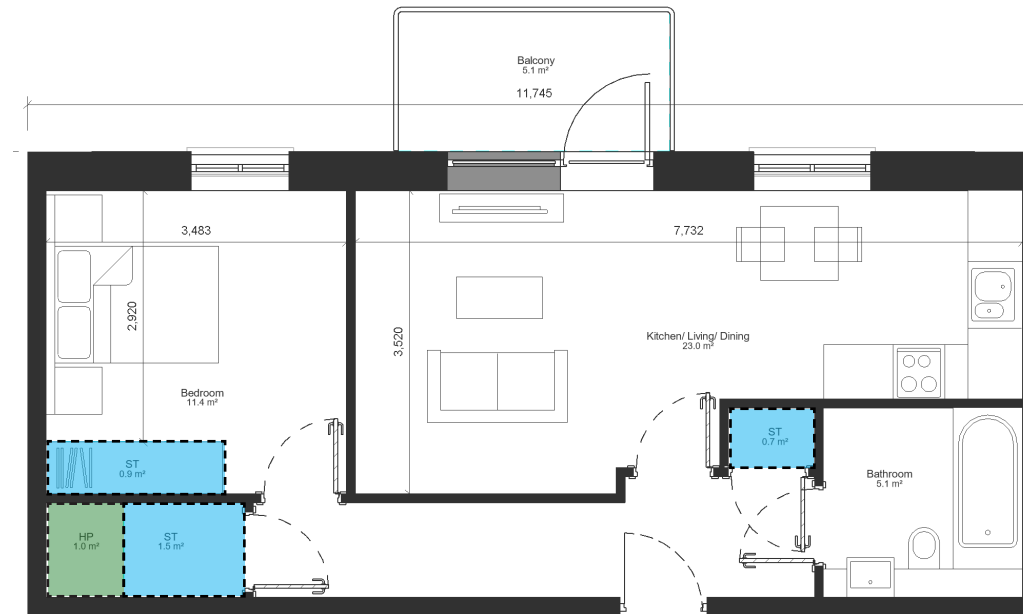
Proposed 1 Bedroom Apartment Layout - Apartment Block
